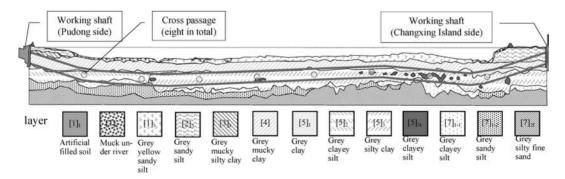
Layout of the cross passages of Shanghai Yangtze River Tunnel.
